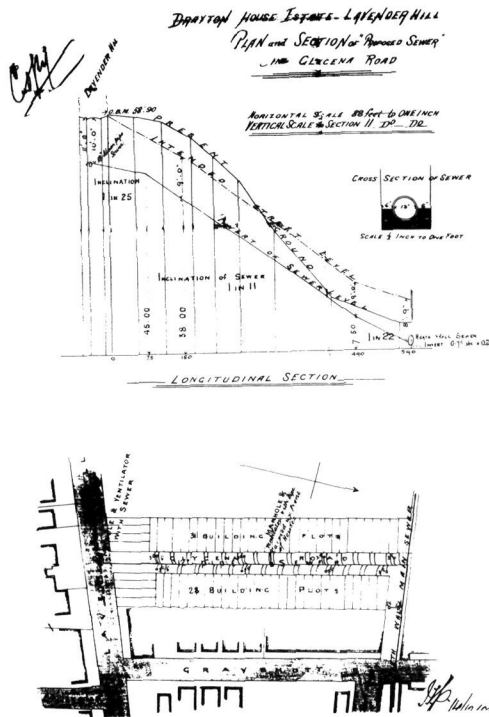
Estate Development: Plan and section for Glycena Road, Drayton House Estate c. 1884.
